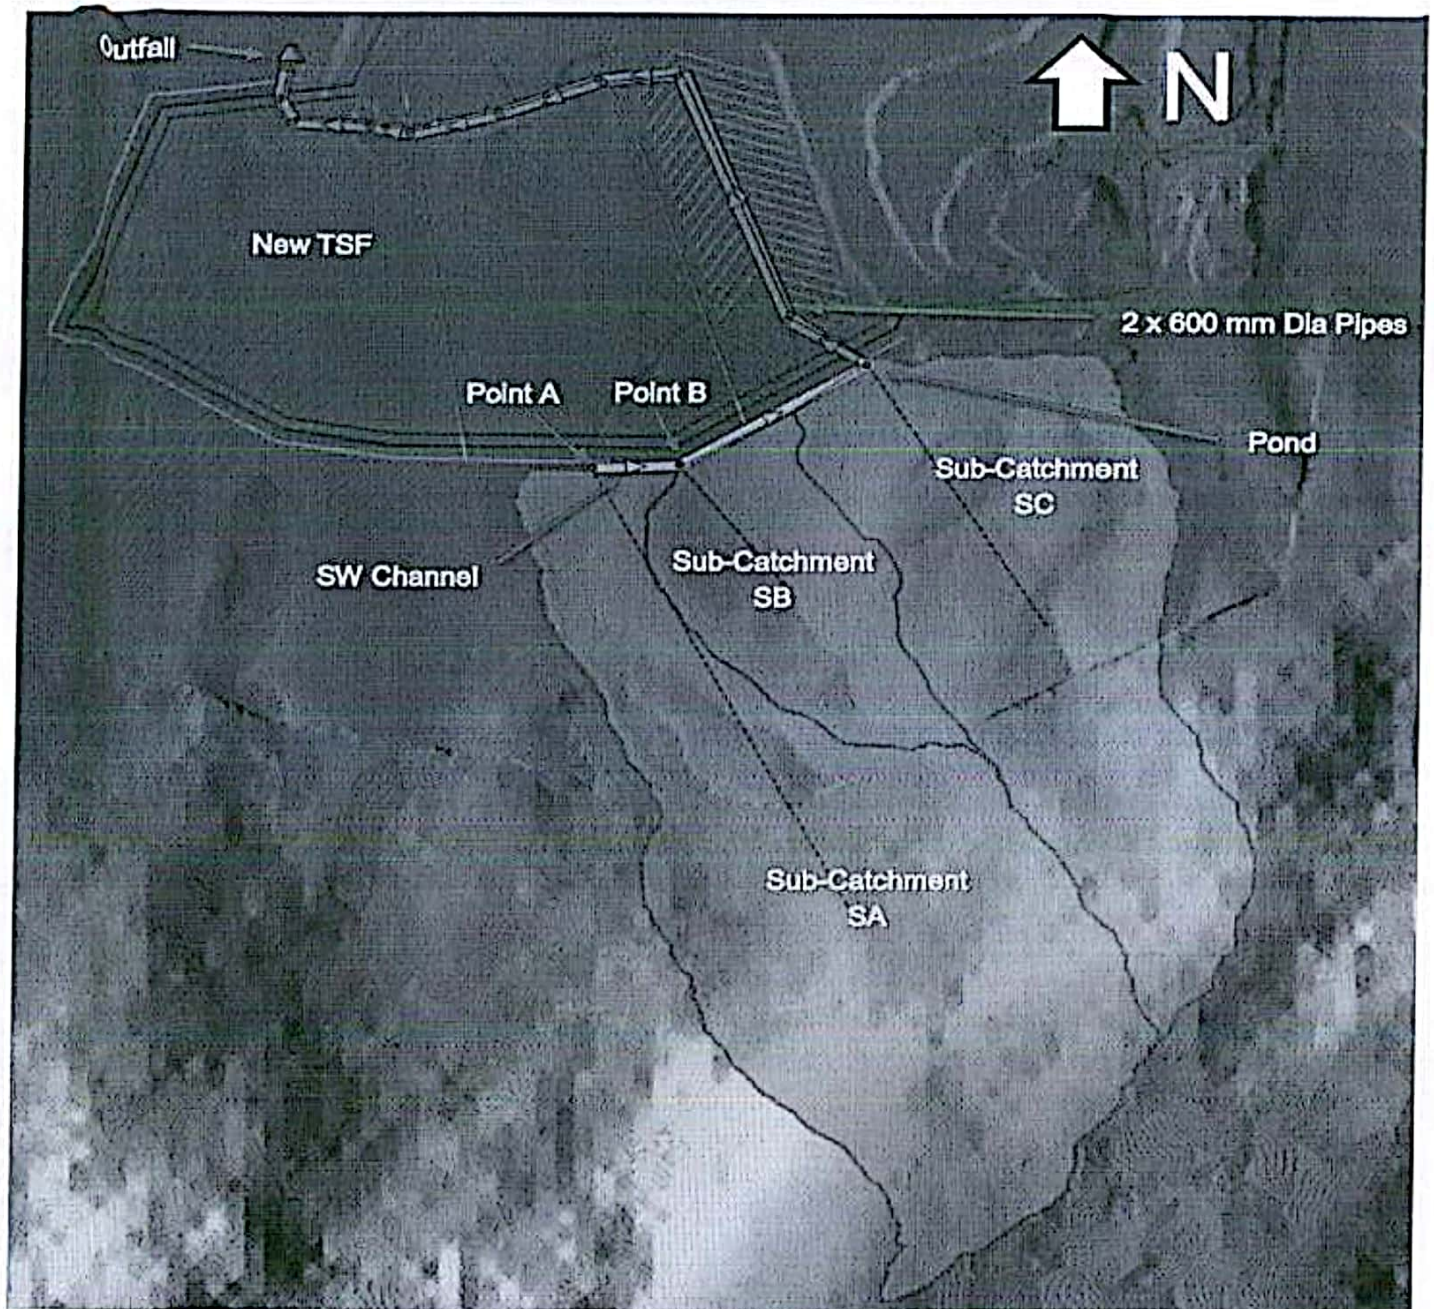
Catchment area for clean water run-off with stormwater channel and pipe layout for its diversion
